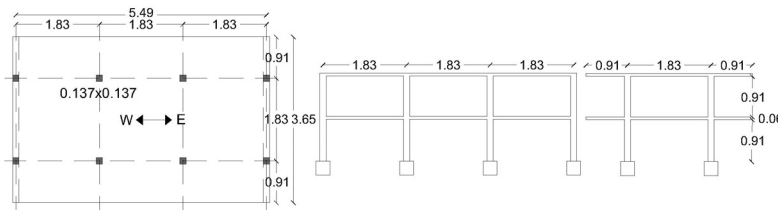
Specimen geometry – Flat-slab multi-storey frame [14] (m).
